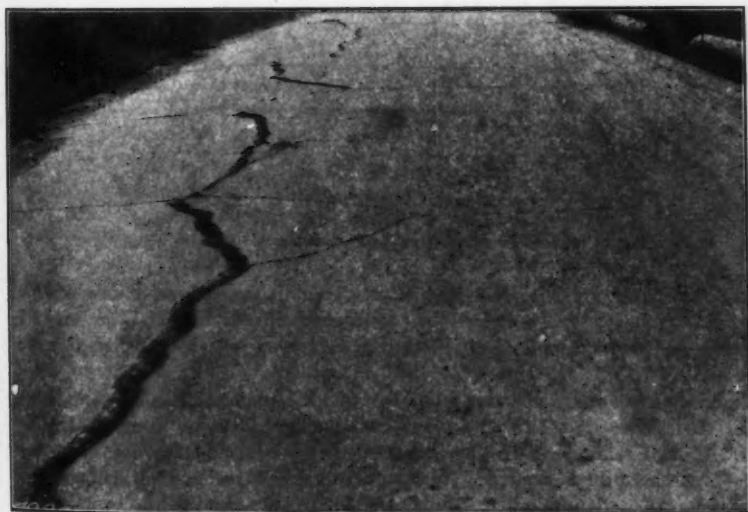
TEST NO. 4, REPRESENTATIVE SAMPLE OF PAVEMENT.
